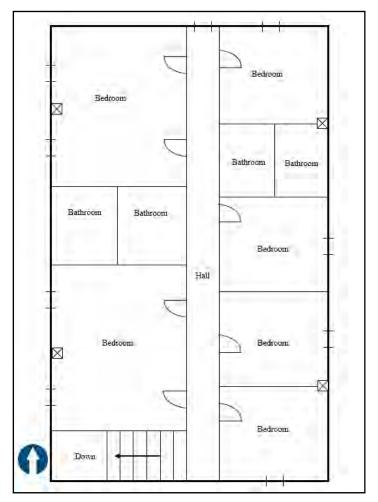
SECOND STORY PLAN (NOT TO SCALE)
